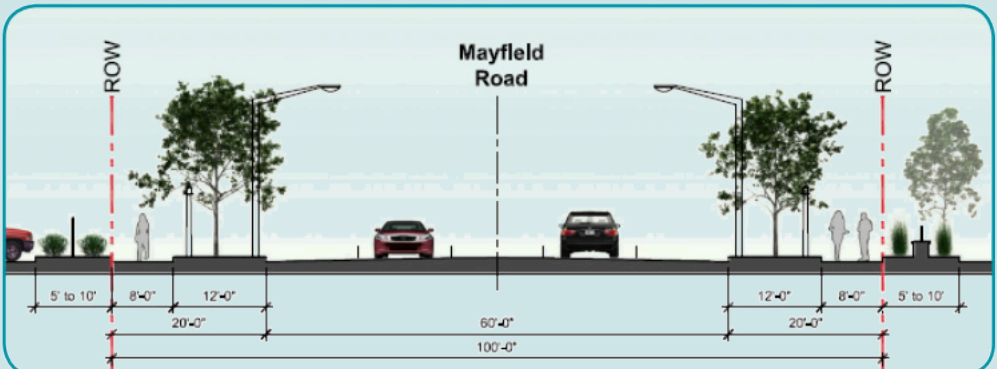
Typical proposed street section of Mayfield Road (AECOM, 2019a).
